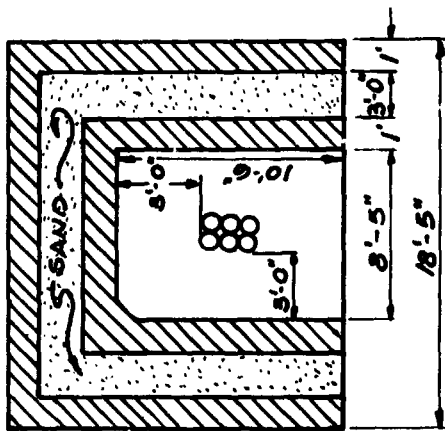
PLAN OF FULL SCALE C-13 CUBICLE
